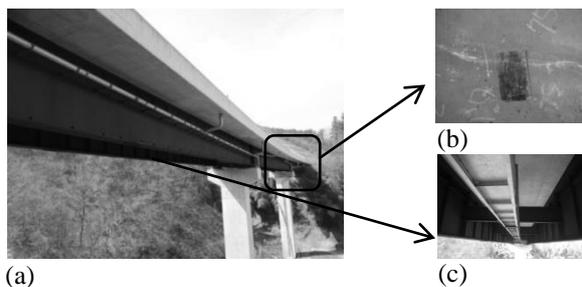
Observation bridge (a) bridge appearance (b) crack in the slab (c) inspection passage.
